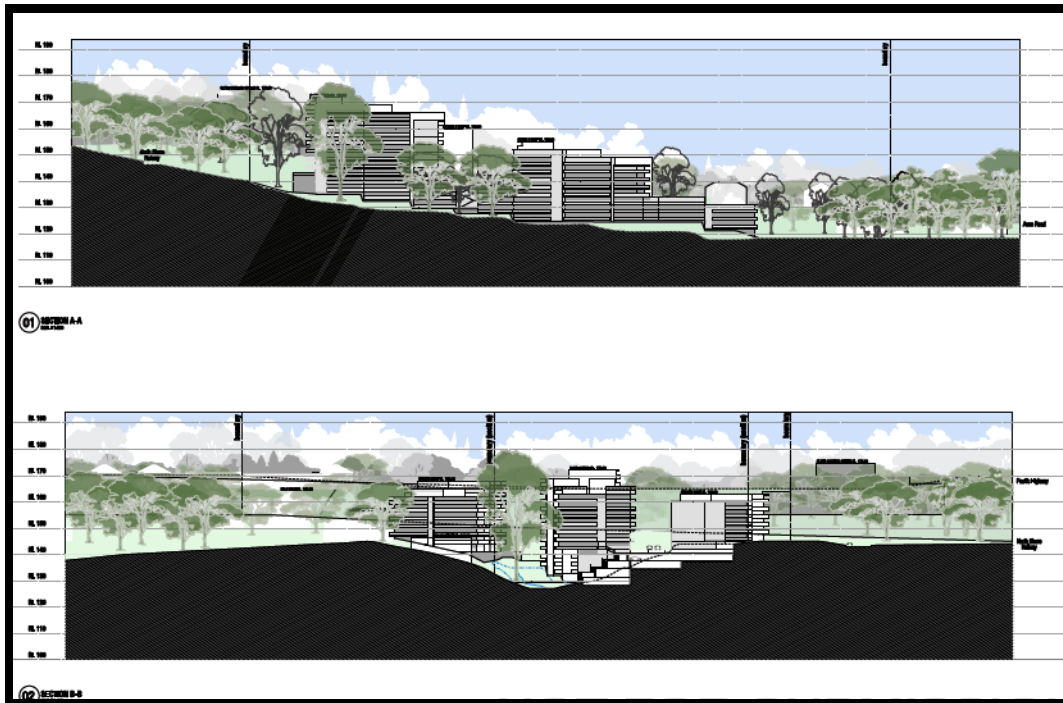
Indicative Sections. (Source: Ancher Mortlock Woolley, 2009)
